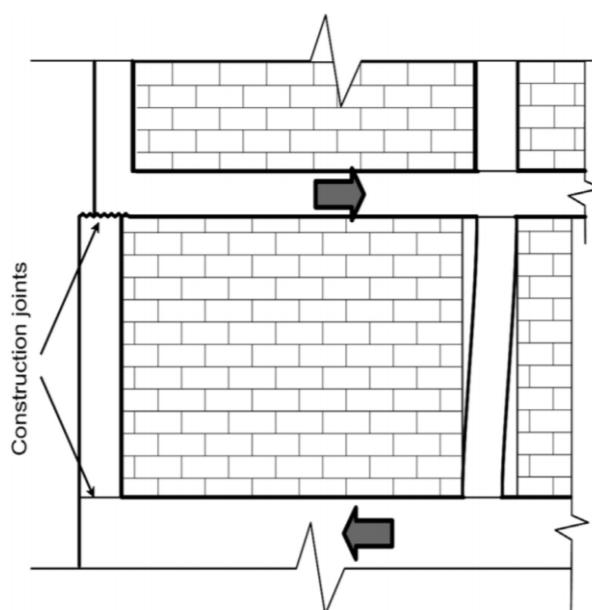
Failure at the construction joint of beam-column connection.
